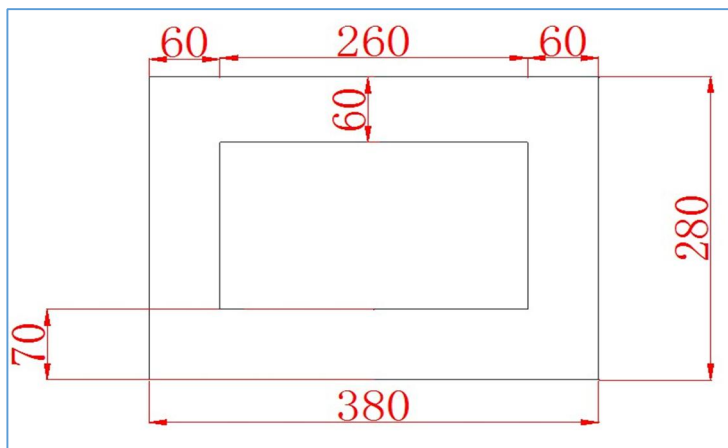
Cross-sectional dimension for post tensioned box girder in mm.
